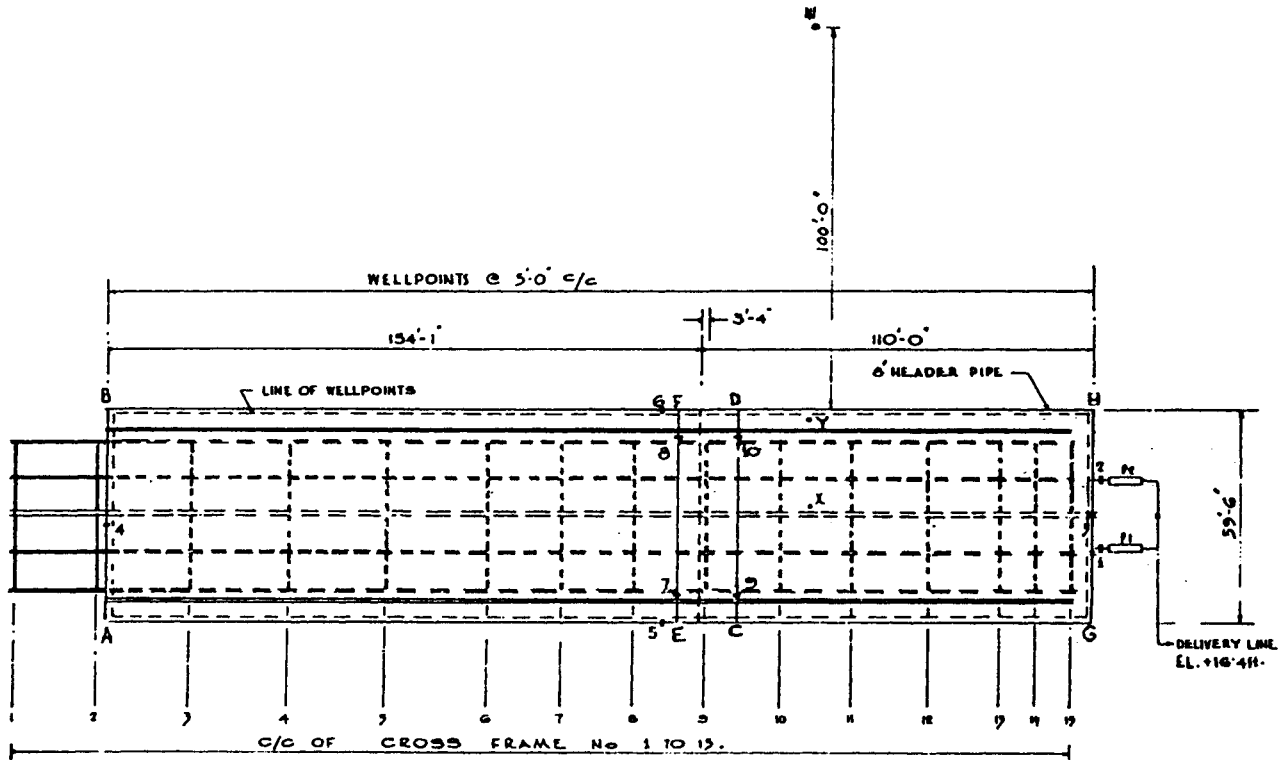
Paradeep slipway dewatering plan. (From Banerjee and Sen, 1970.)
